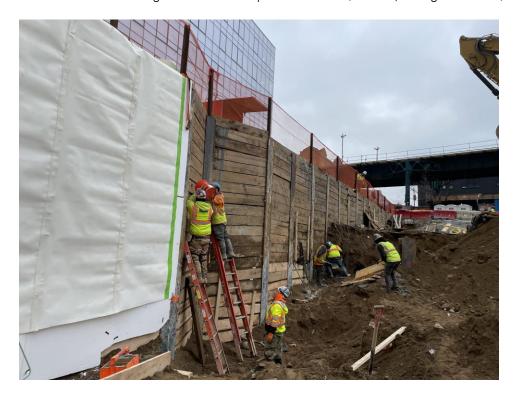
ECD installing waterproofing and SOE lagging in the southeastern part of the site (facing west).
